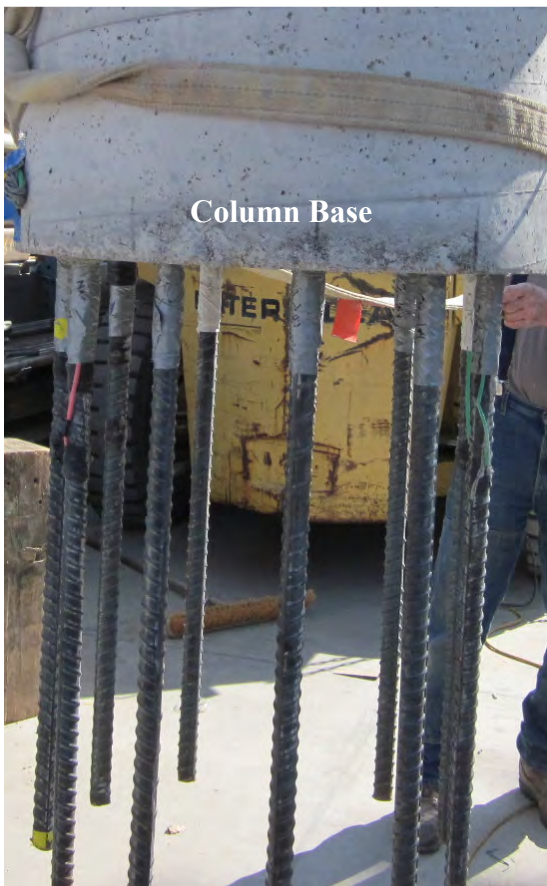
Construction Stages for PNC Column w/ UHPC-Filled Duct Connection at Base
